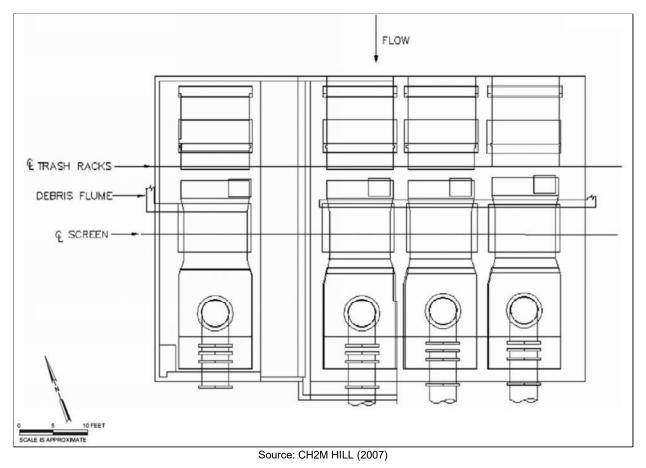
Typical Plan View of Chesterfield Power Station CWIS
